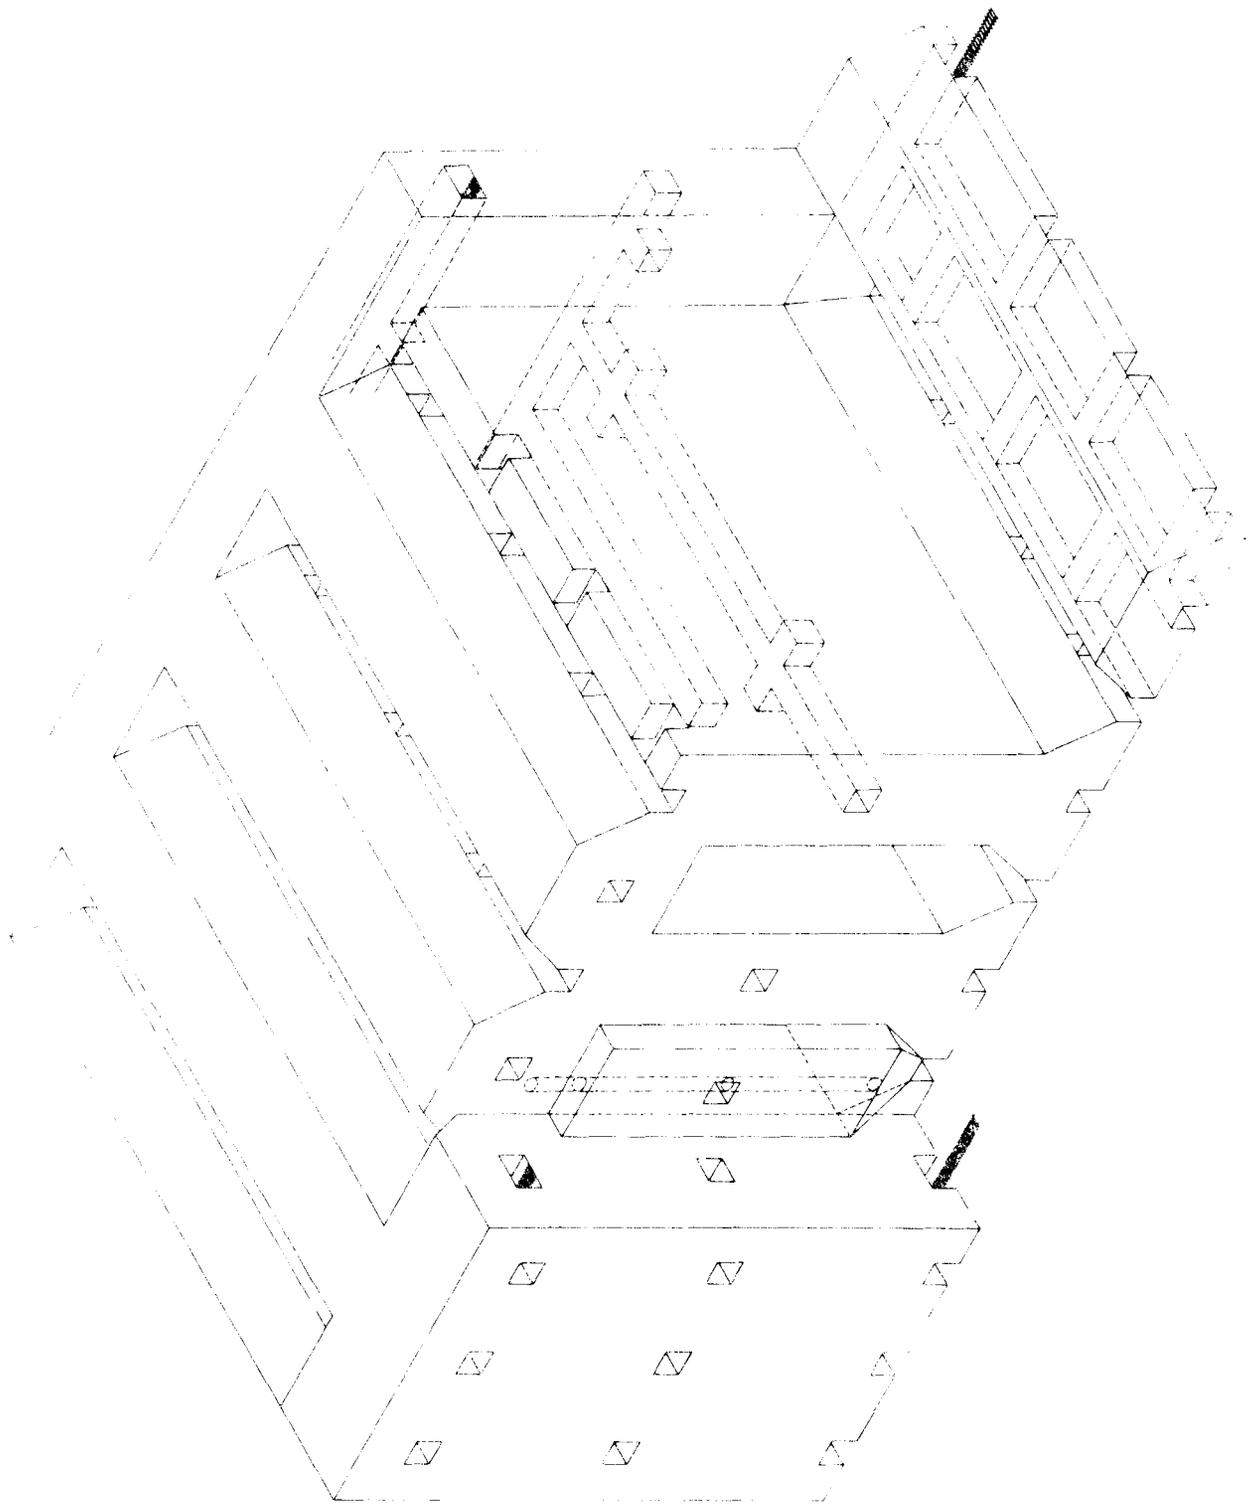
Isometric View, Sublevel Stopping with Full Subsidence
